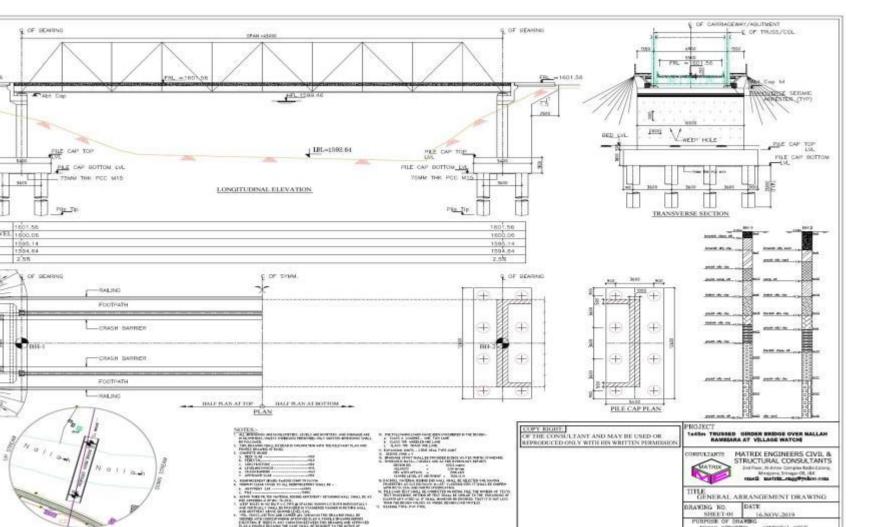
General Arrangement Drawing (GAD) of the Proposed Construction 1x45 meter Bridge on Rambiara Nallah at Kumar Mohalla Wachi in District Shopian
